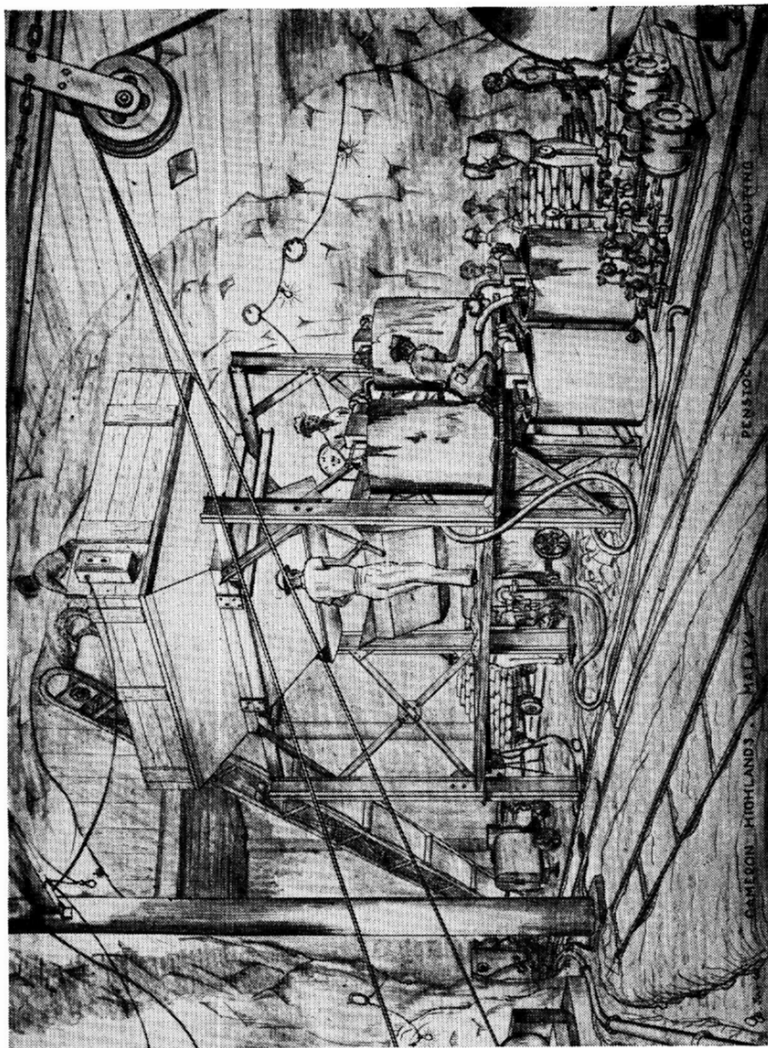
PENSTOCK GROUTING: MIXING INSTALLATION AT TOP OF SHAFT
